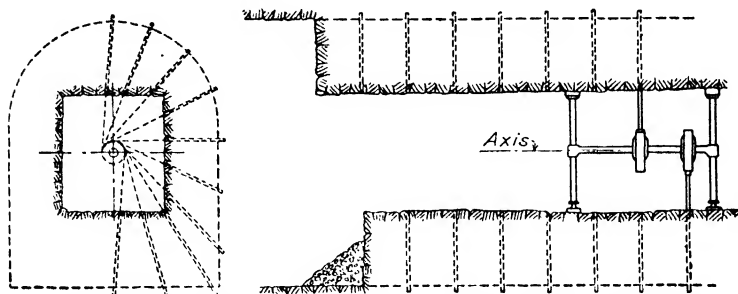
Ring drilling for enlargement to full size from a center drift.
